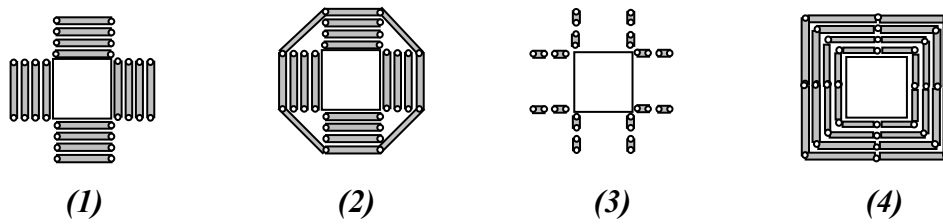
Detailing of CFRP reinforcement (Plan View)
